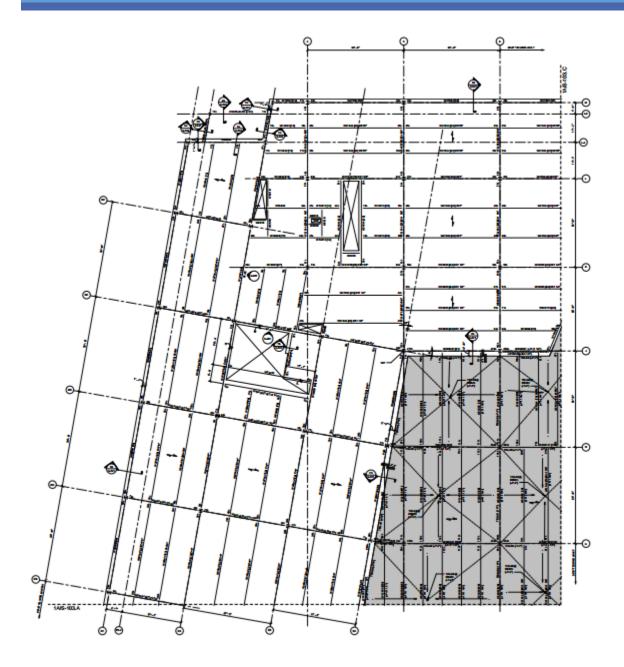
TYPICAL SEGMENT B FLOOR FRAMING PLAN
